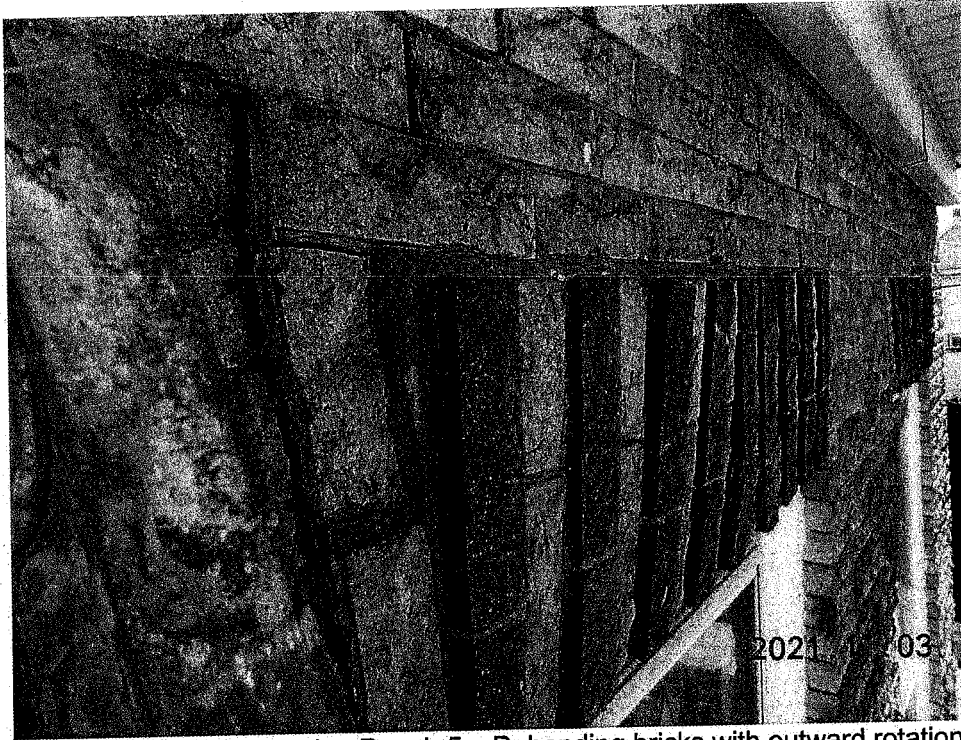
Routine Repair 5 – Debonding bricks with outward rotation in brick masonry header – West Elevation, Grid E-F (north): Ht. 20' +/-
